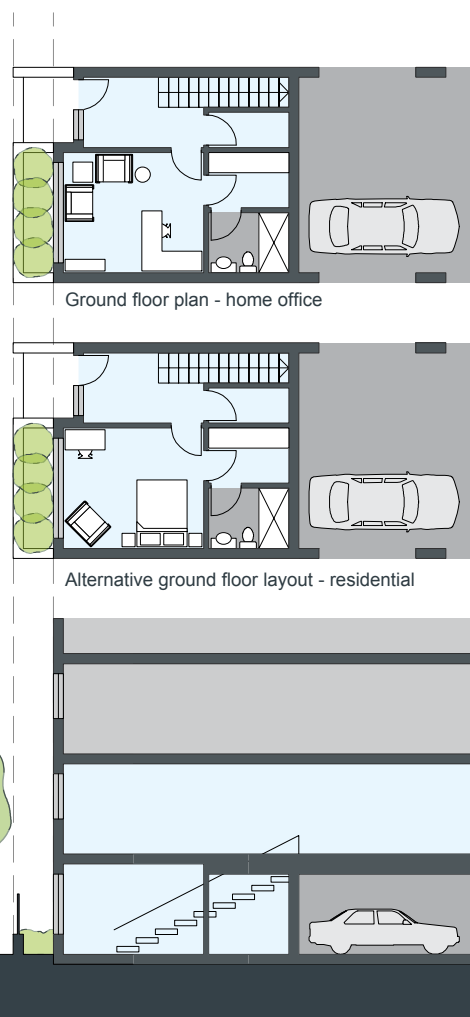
B.3 Plan and section of a double storey apartment which is directly accessible from the street
